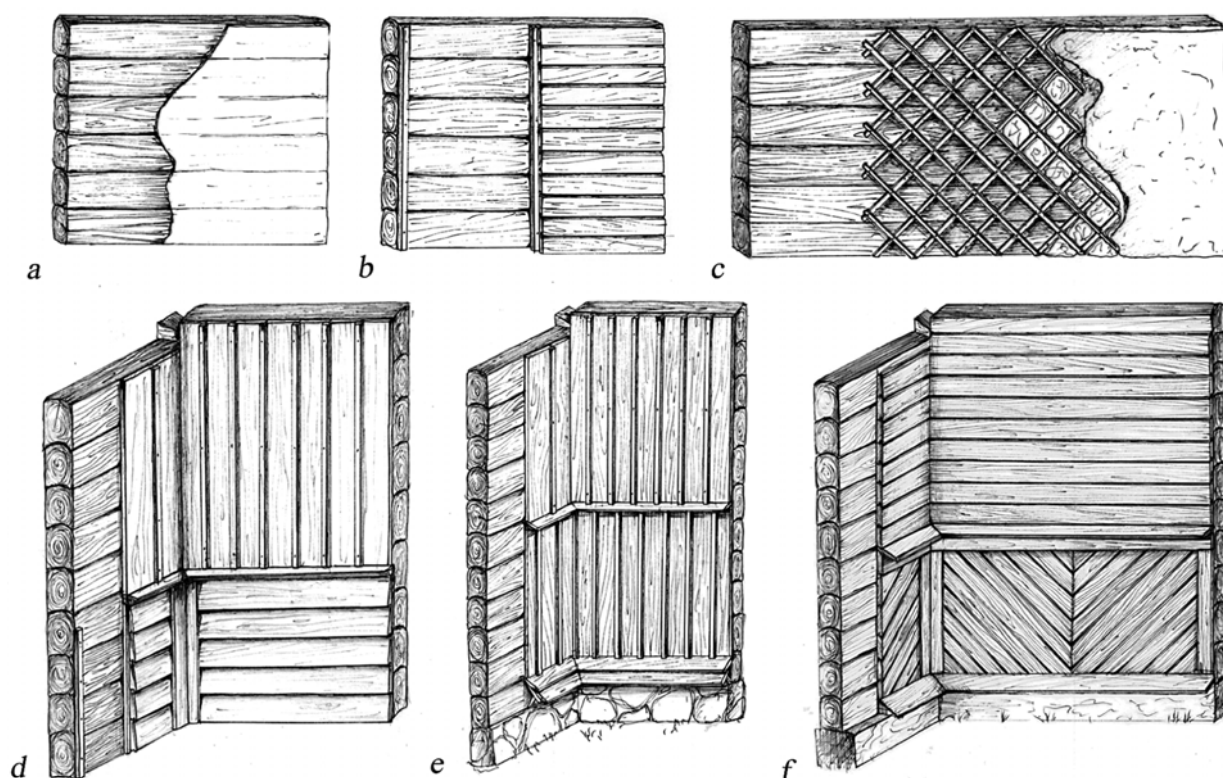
Internal (a-d) and external (e,f) wooden wall cladding (designed by L. Berežanskytė)
